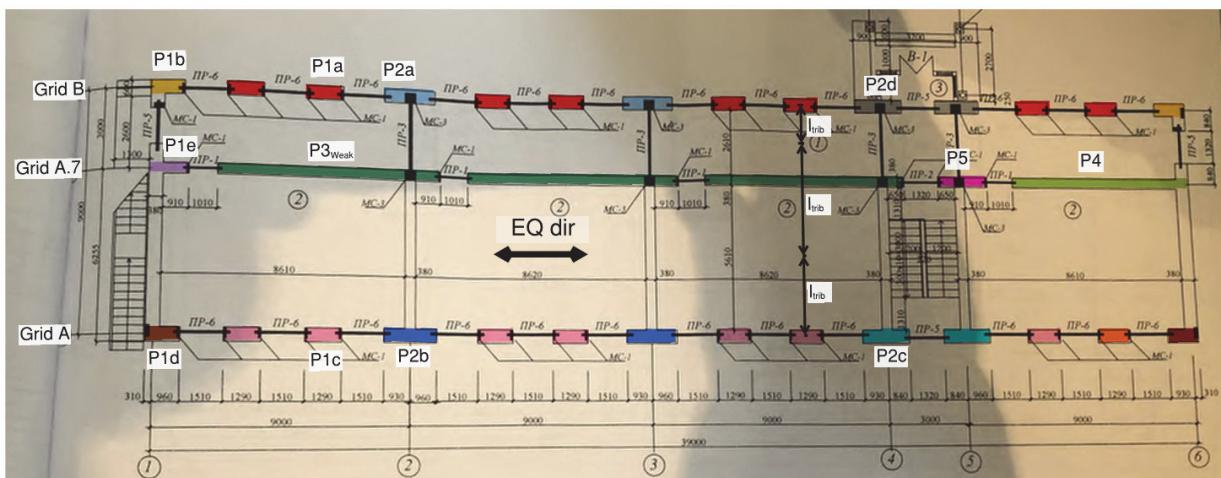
Map of participating piers and walls contributing to the longitudinal pushover.
